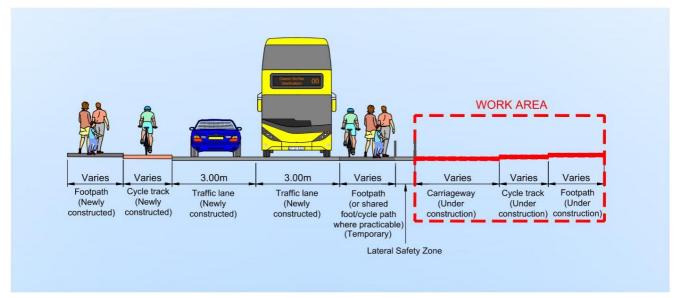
Traffic Management Cross Section, Section 1c – Stage 1
